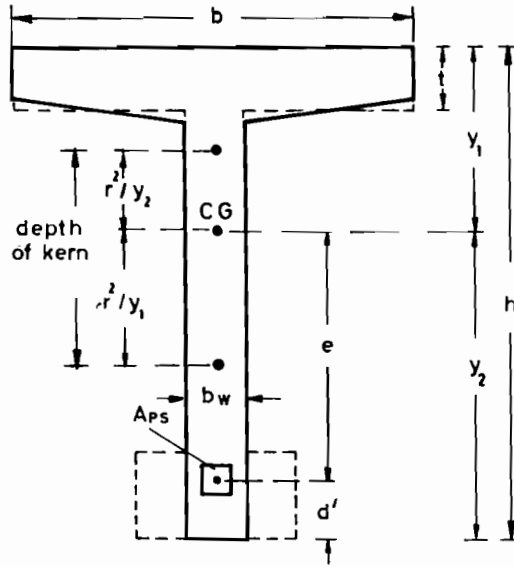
Dimensional designation of a flanged section of prestressed concrete beam.
